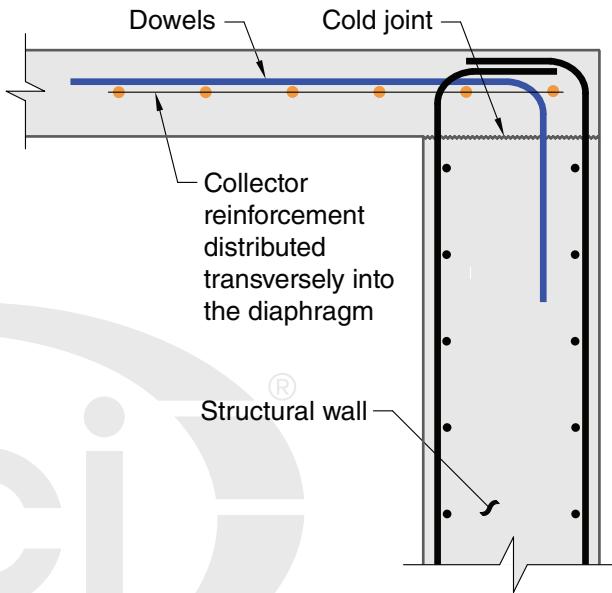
Typical detail showing dowels provided for shear transfer to a structural wall through shear-friction.
